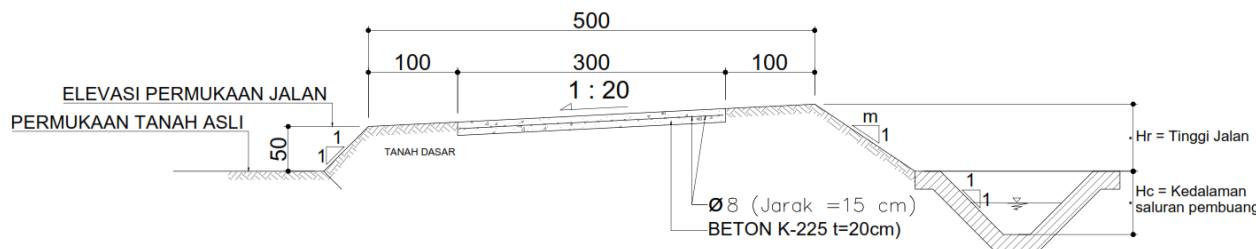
TYPICAL INSPECTION ROAD OF IRRIGATION CANAL OF CONDITION IV
